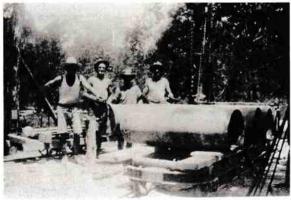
Ollera Creek pipeworks, Mt Spec Road in 1932. Hundreds of concrete pipes used in Mt Spec Road were made here.
